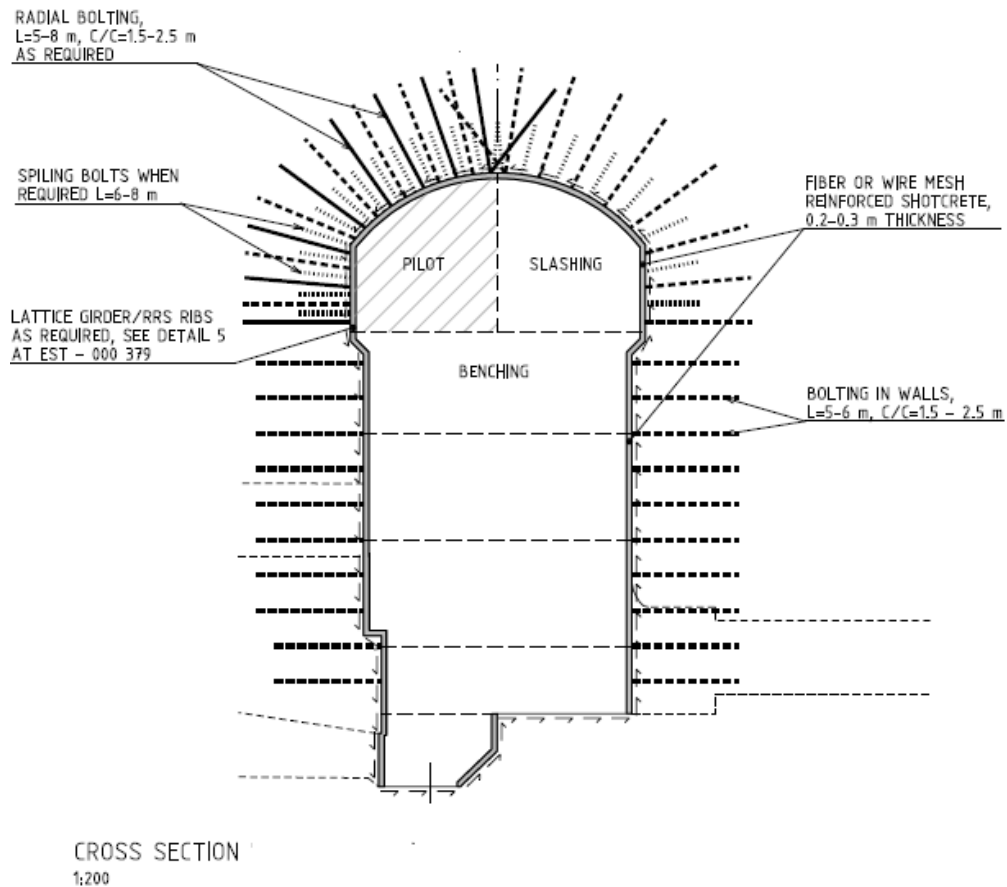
2: Proposed support in a cross section of the powerhouse cavern (Norconsult, 2011).
